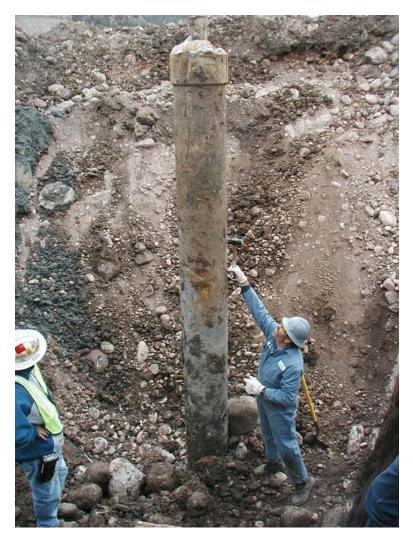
Bryce 1-X excavation complete, note gray sandstone surface at bottom of conductor pipe, view north.
